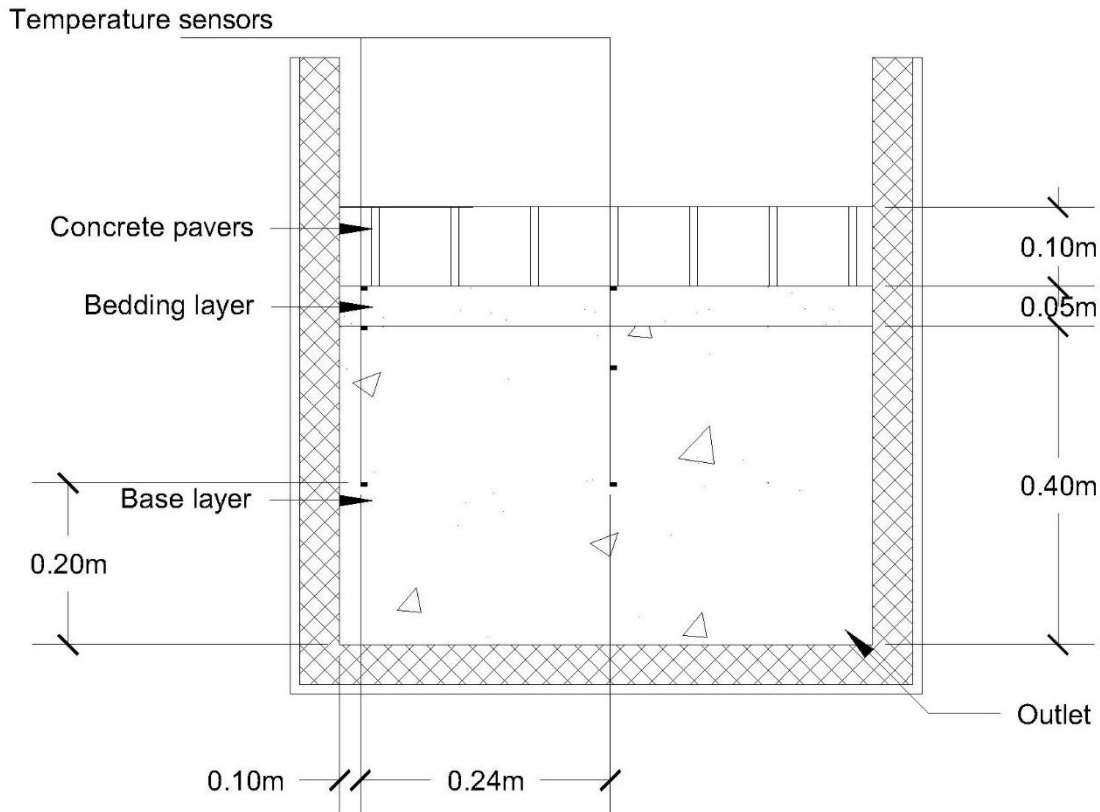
Construction of the permeable interlocking concrete pavement for the pilot with placement of the temperature sensors.
